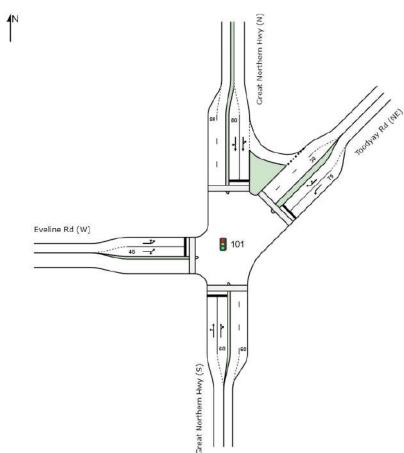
Great Northern Highway / Eveline Road / Toodyay Road SIDRA Layout
